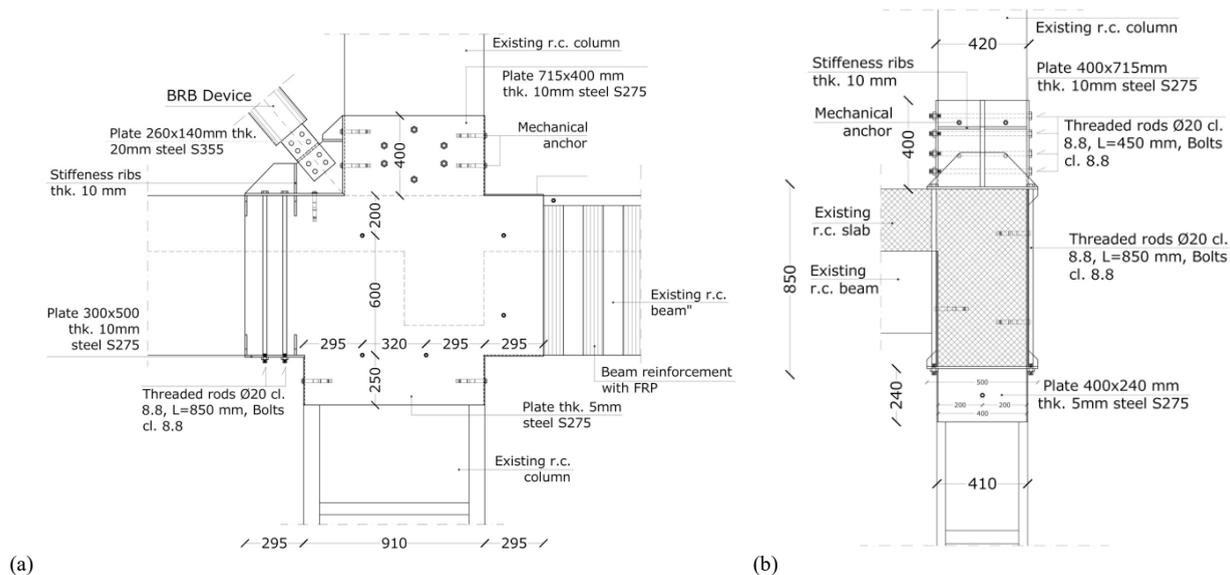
Shear strengthening of beam-column joint with steel plates: (a) Front view; (b) Section view.
